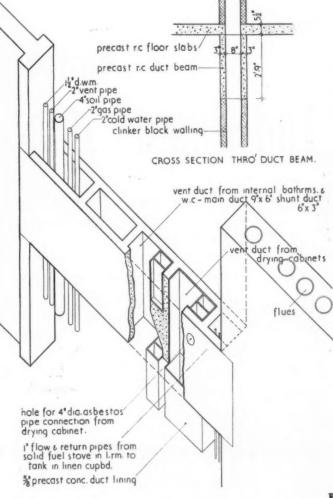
(above). Plumbing at bathroom level in 11-storey block, with connections for back-to-back w.c., bath and basin. From left to right: rising main, vent pipe, soil stack, gas main and cold water supply. The supporting brackets are temporary, holding the branches in position pending the fixing of equipment. Note " push fit" sockets. Fig. 11 (right). Axonometric diagram and section through duct beam.
